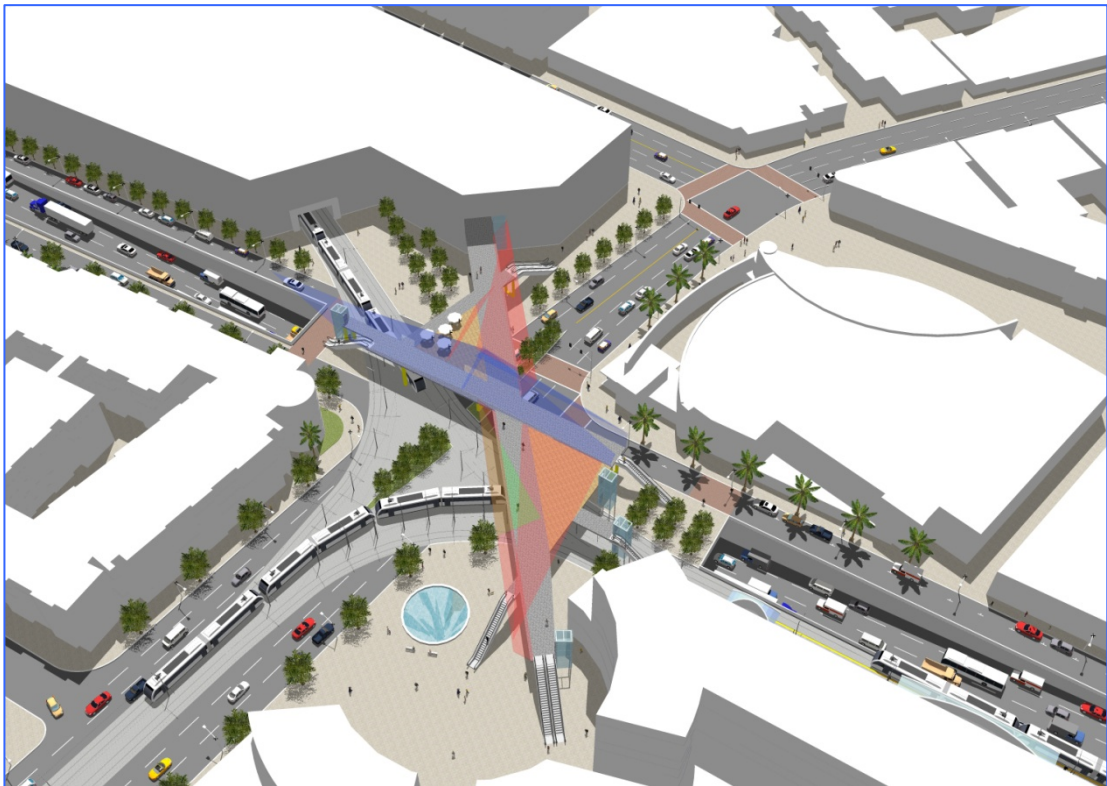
Underground Emphasis LRT Alternative – Intersection of Alameda and 1st Streets Looking Southwest
